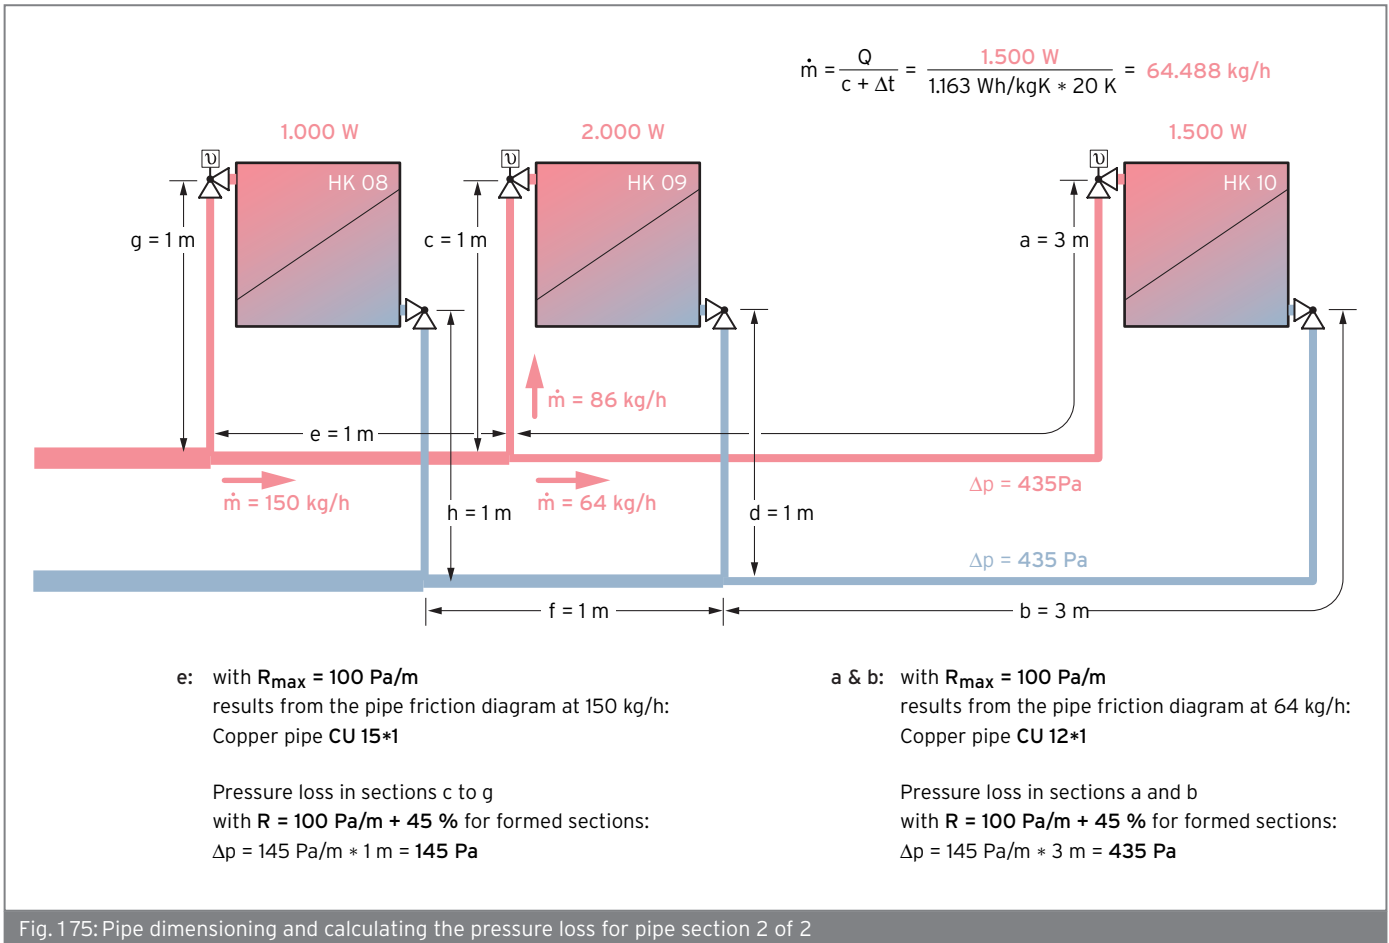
Pipe dimensioning and calculating the pressure loss for pipe section 2 of 2
